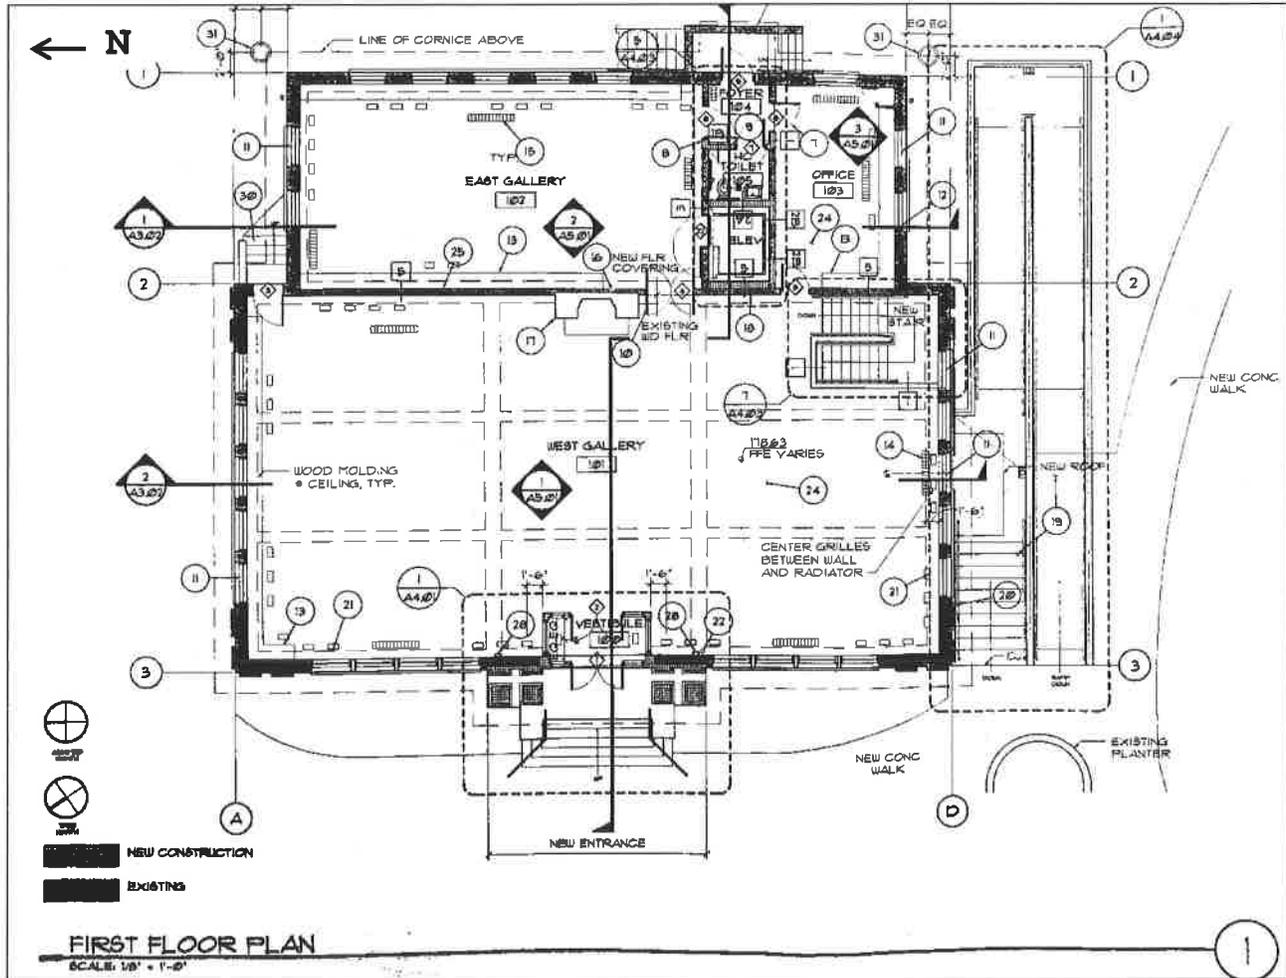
Renovated First Floor Plan, Slusarenko Architecture, PC, 2001.
